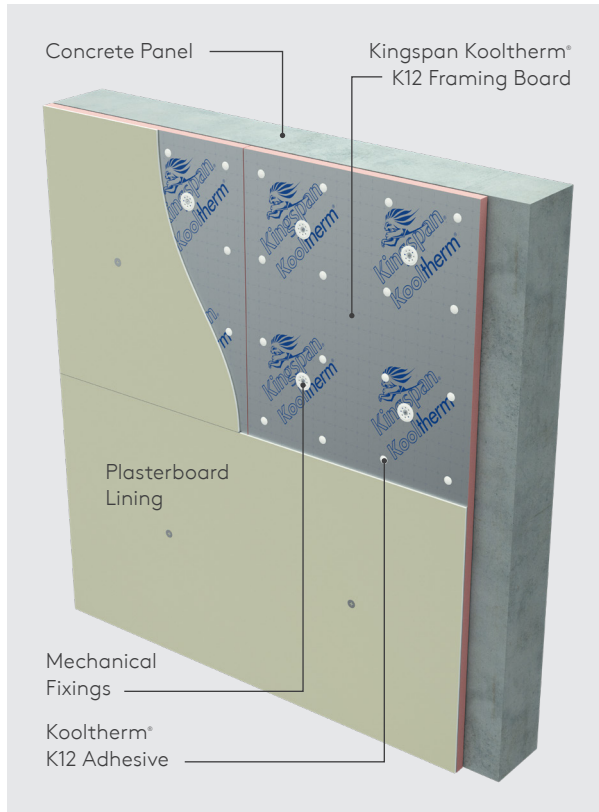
Kingspan Kooltherm K12 Framing Board mechanically fixed to the concrete wall, with the plasterboard adhered to the framing board using Kingspan Kooltherm K12 Adhesive.
